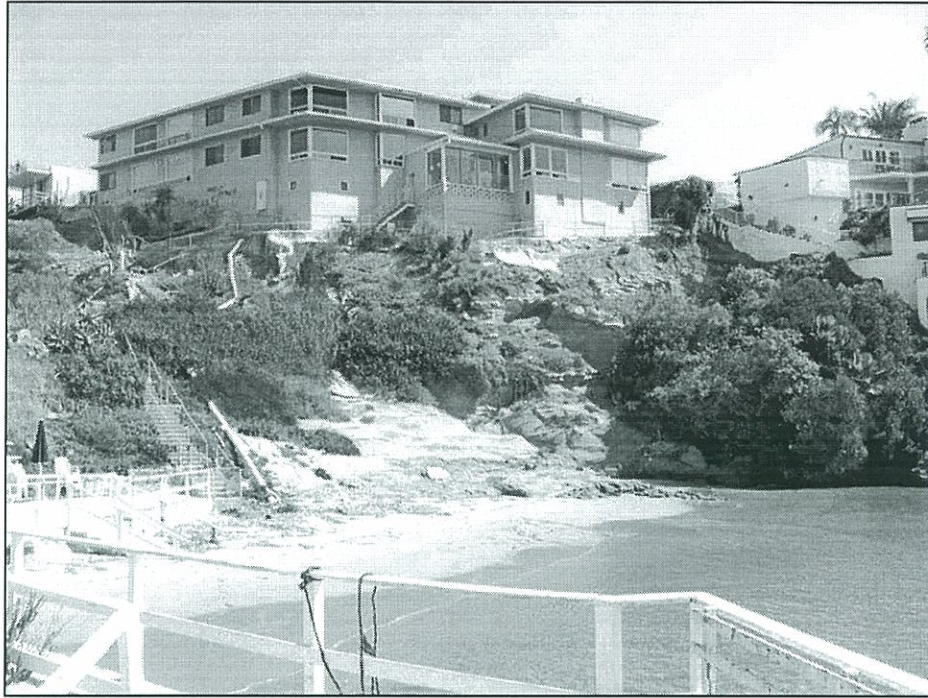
Photo A - Looking east toward existing apartment building. Remnant coastal sage scrub and ornamental vegetation was observed on the slope below the building.
